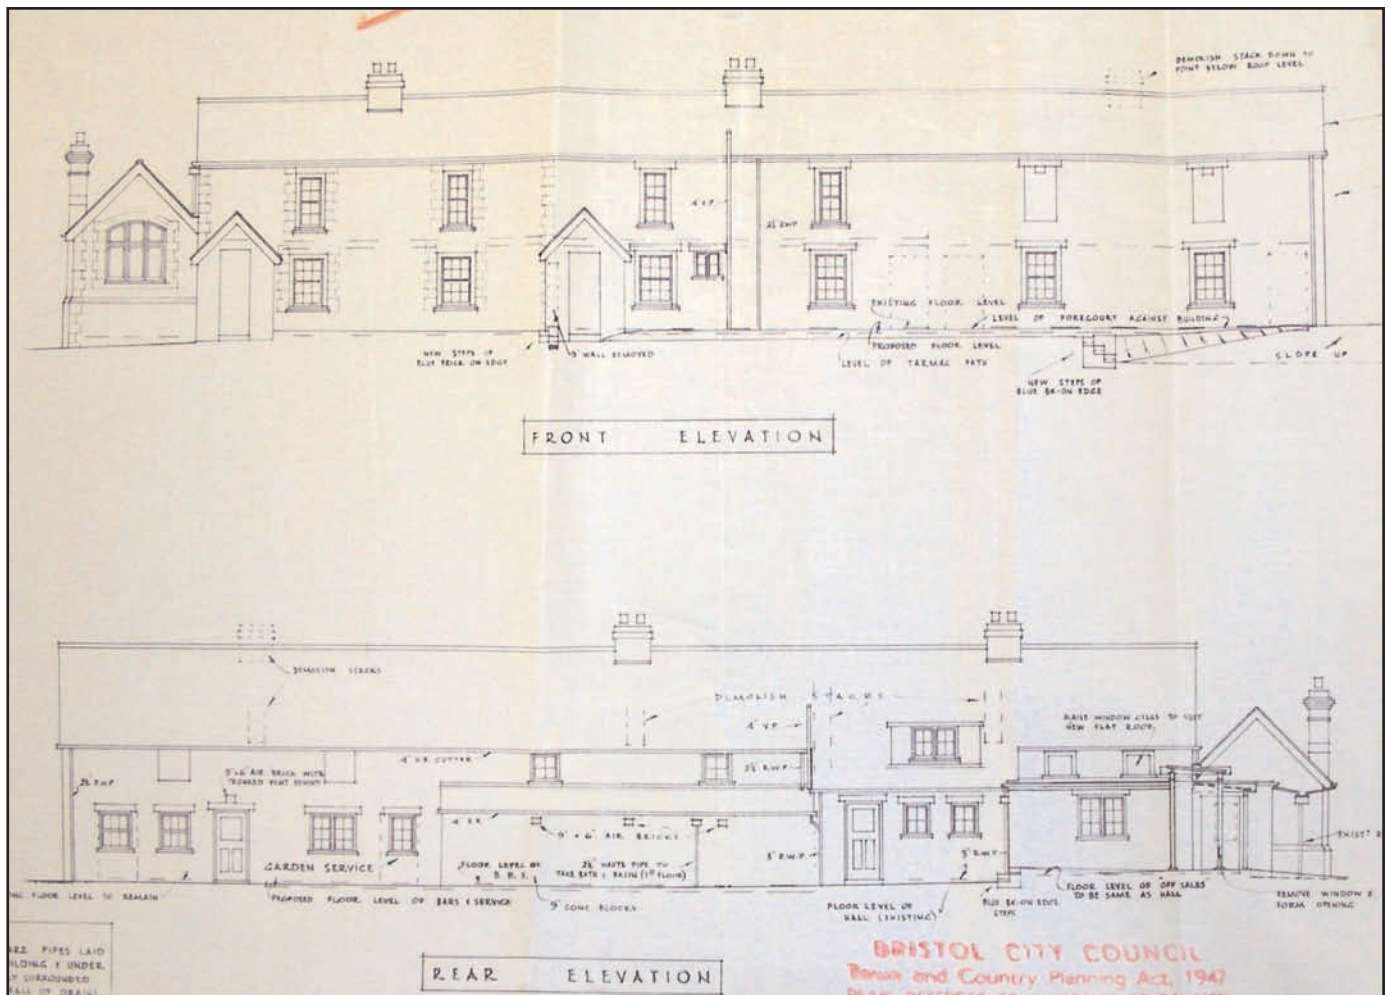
Extract from architectural drawing (north-west and south-east elevations) for proposed alterations (not undertaken) to the Masons Arms and four houses on the study area, dated 1952 (BCC)
